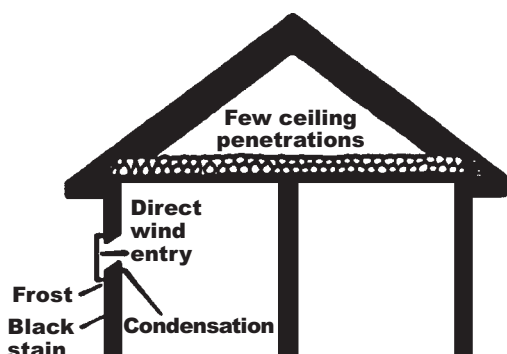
Exhaust fans vented through walls are easier to install, but frosting, condensation and cold air entry are still problems.
